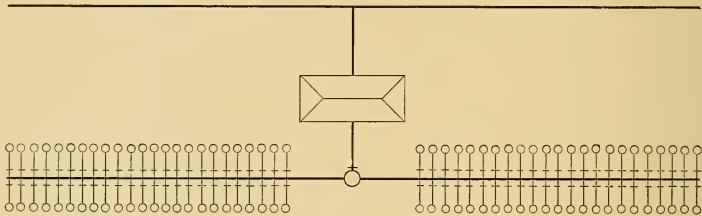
ANOTHER PLAN OF WELL BATTERIES
